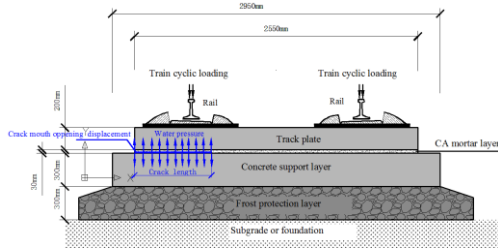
The CRTS II slab track in the subgrade section consists of rail, fastener system, pre-stressed concrete slab, CA mortar layer and concrete support layer (Figure 1).
